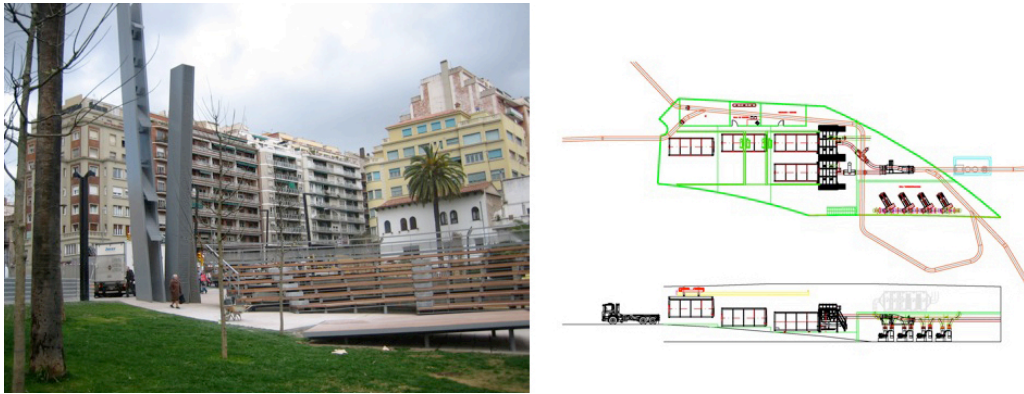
Plaza Lesseps, Barcelona, View of Terminal Stacks Which Double as Lighting for Park (Left); Plan and Section of Terminal (Right)
